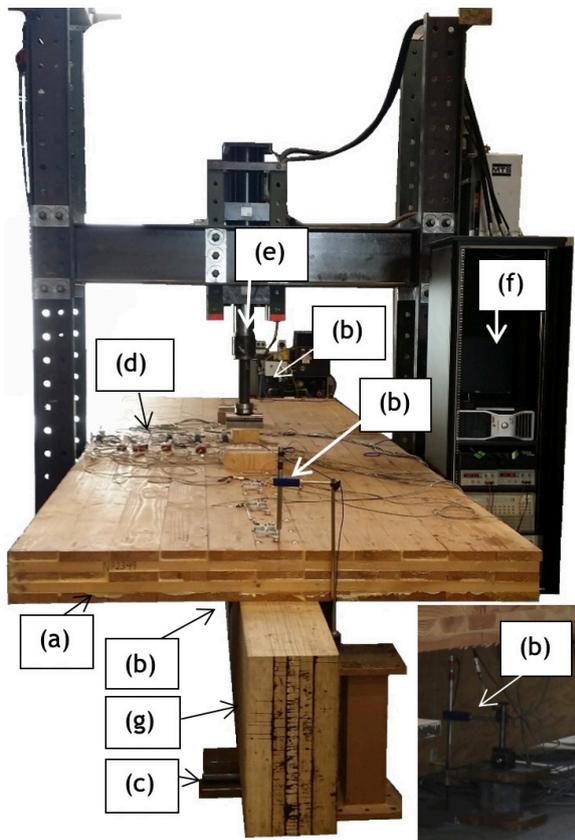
The CLT-LVL composite T-beam test set-up. (a) The CLT panel, (b) LVDT (c) Roller support, (d) Portal gauges, (e) MTS Machine, (f) Data acquisition system, (g) LVL beam.
